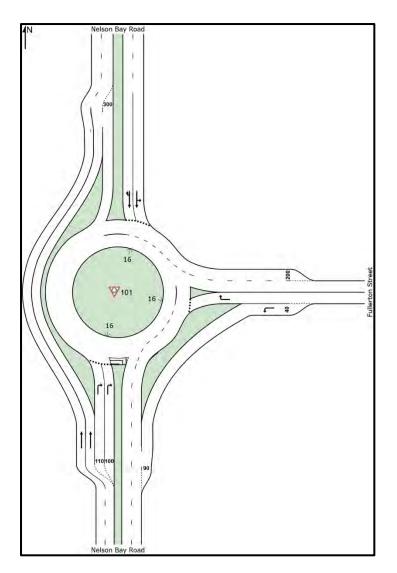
Sidra layout for upgraded roundabout at Nelson Bay Road / Fullerton Street
